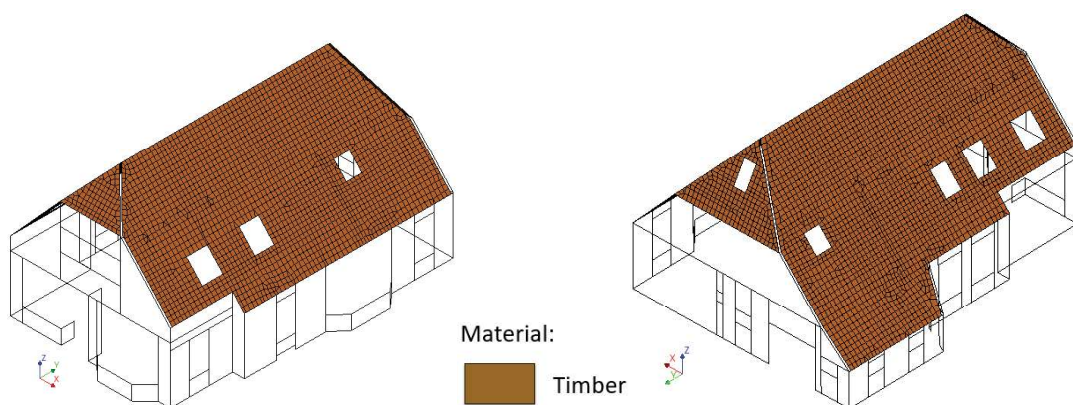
Roof boards. South-West view (left) and North-East view (right).
